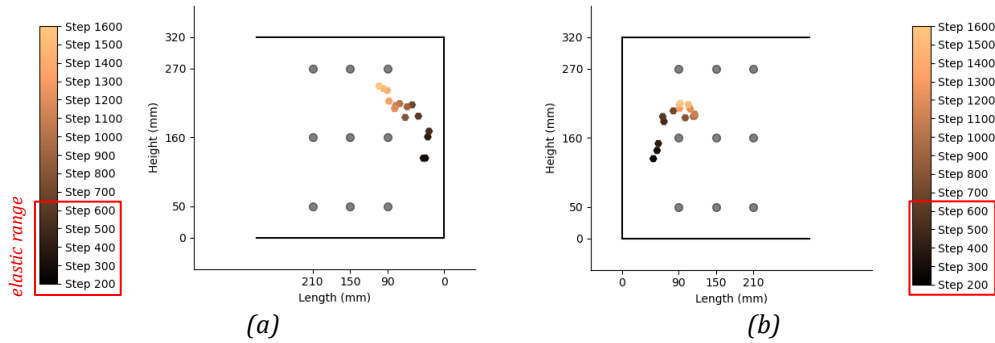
Experimental centre of rotation for reinforced connection (Test 3): a) left beam, and b) right beam
